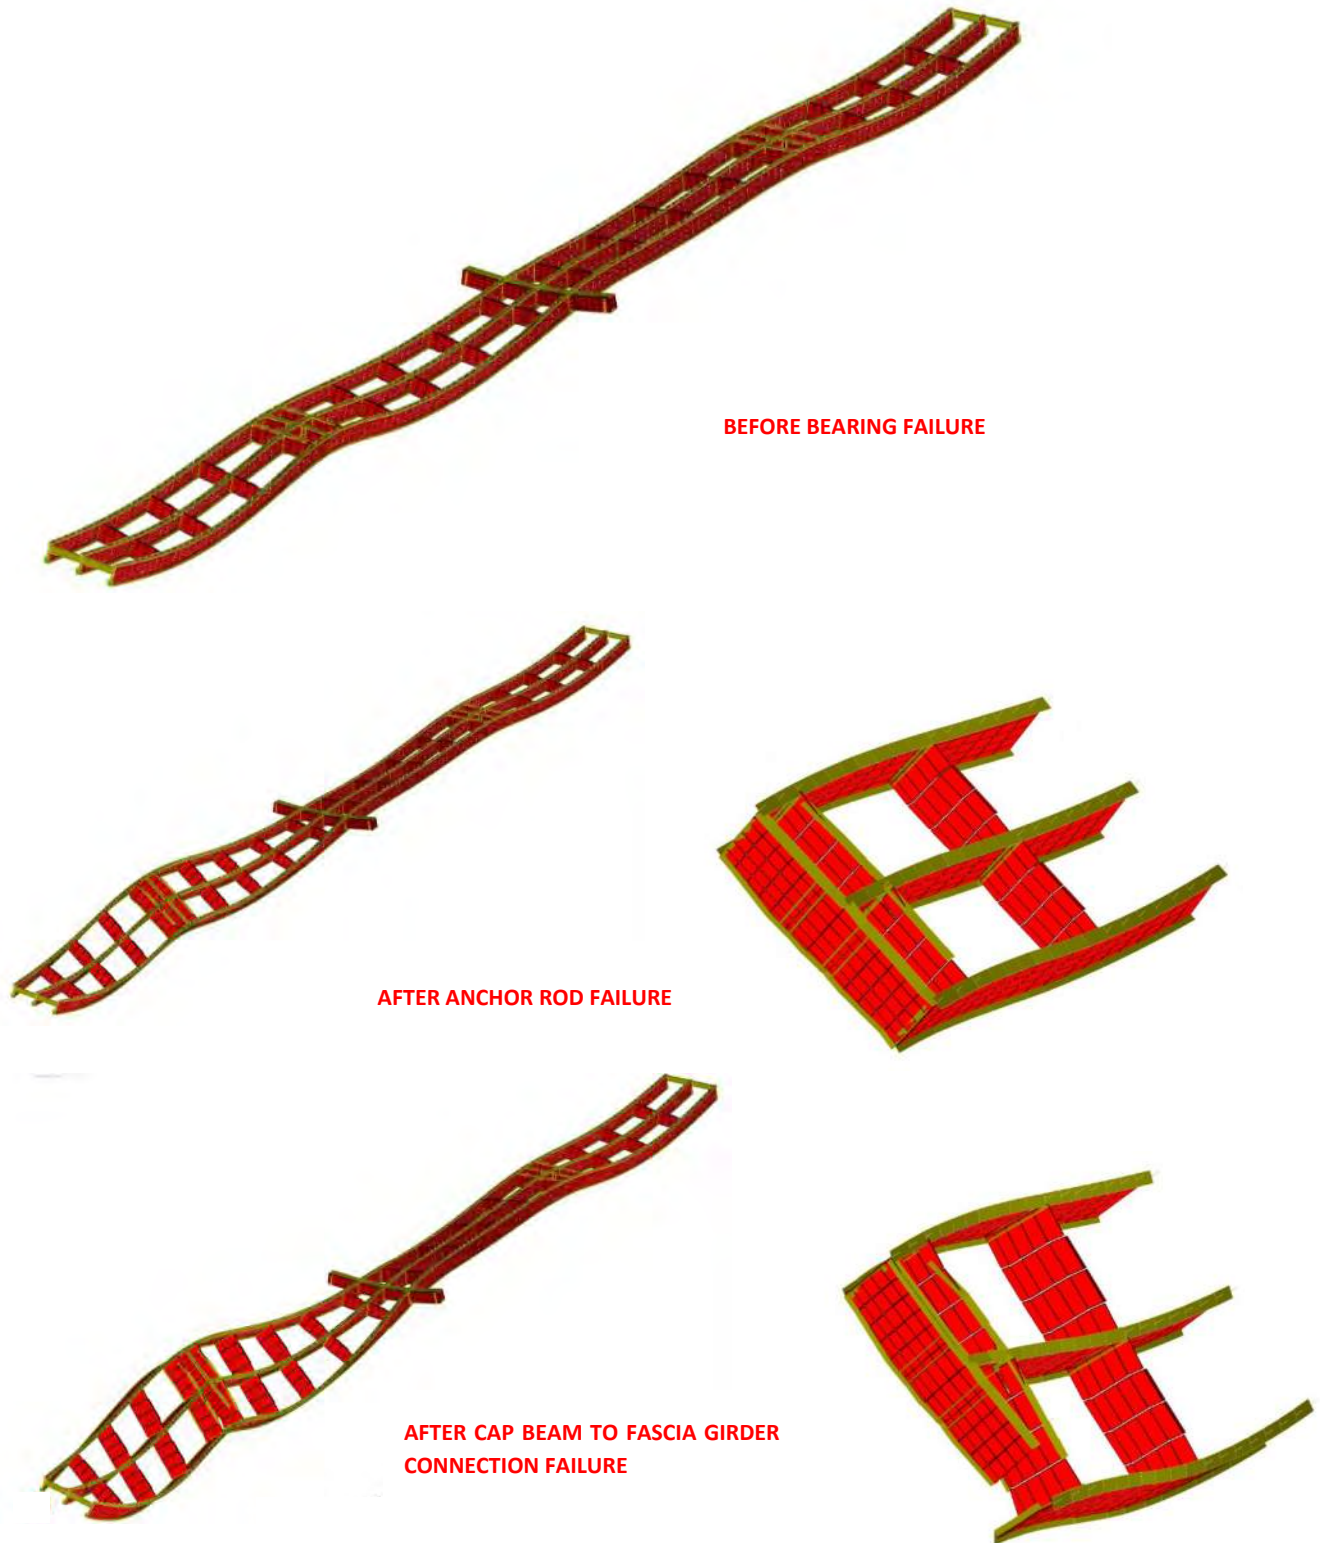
Progression of failure at Integral Pier Cap (Deck not shown for clarity)
